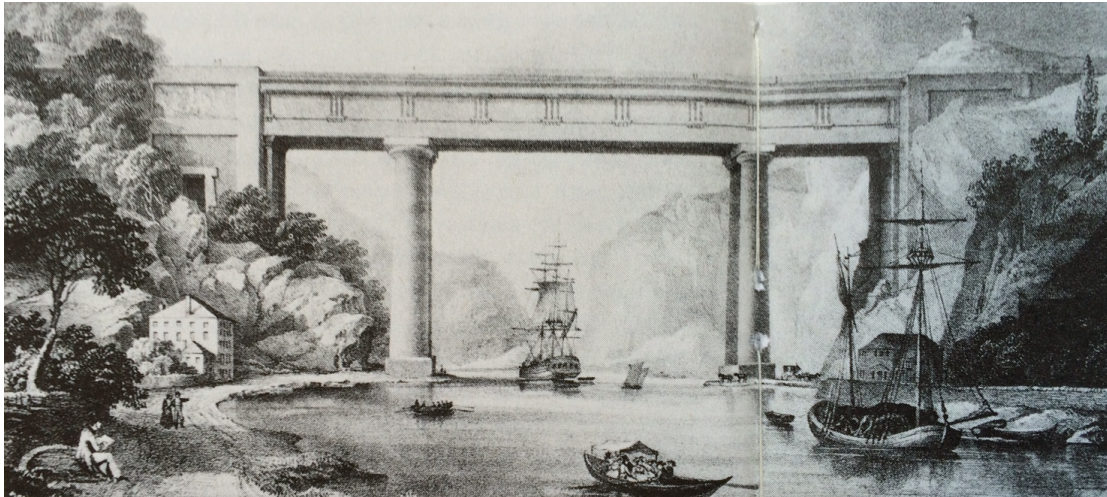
Burge's stone beam bridge design. From *Clifton Suspension Bridge*, Geoffrey Body, 1976.
